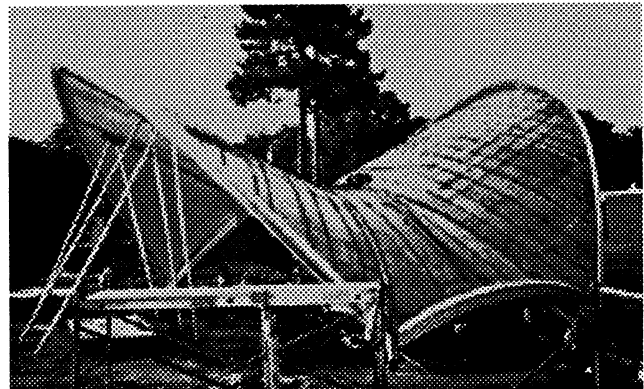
Completion of lateral entry vaults and placement of rebar for casting of 2" lightweight concrete shell. The concrete was not needed for gravity or normal wind loads, but was added as dead weight as a precaution for unpredictably high wind. Conceived for weight, the concrete shell was made structurally integral by securing rebar to plywood vault with screw eyes and by welding bars at the vault edges and in the valleys directly to steel beam connector plates to transfer some concrete load directly to piers.
